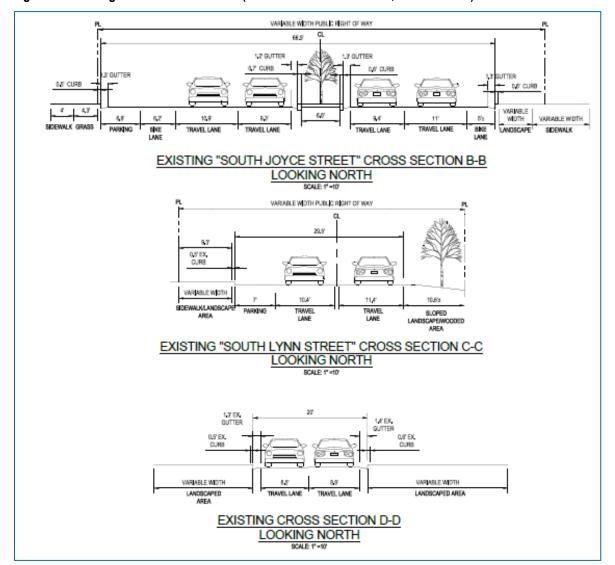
Existing Street Cross-Sections (Source: PDSP Submission, Sheet CIV703)
